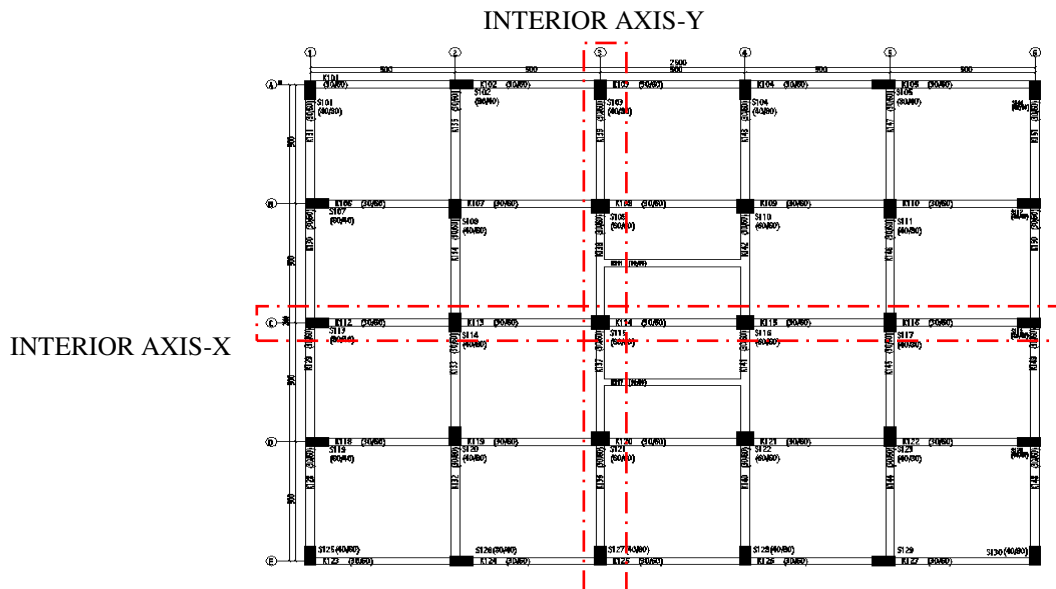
Plan view of the considered buildings (Selected frame models are also marked.)
